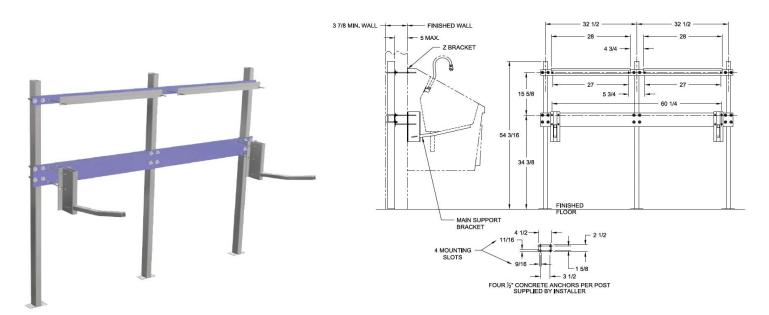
In-line wall carrier mount SMDSINKCARRIER
